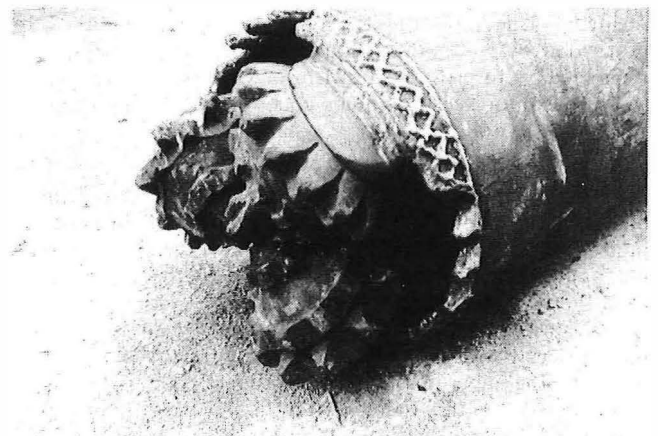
Rock drill welded to the leading edge of the 300 mm diameter steel pipe
